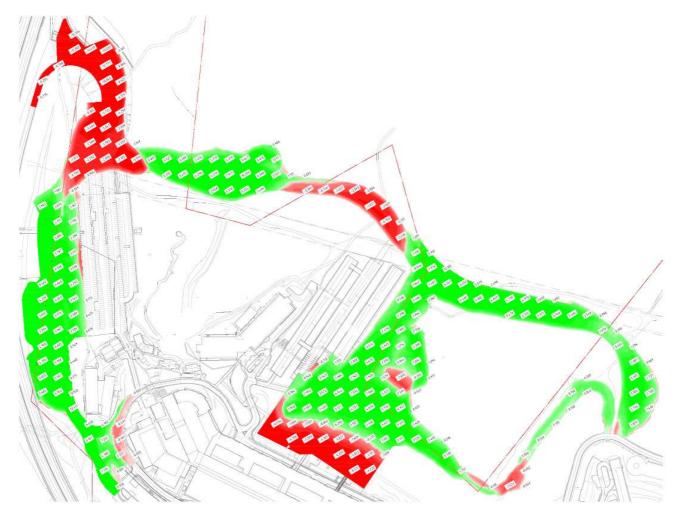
Cut and fill plan for the site (green showing fill, red showing excavation required)
